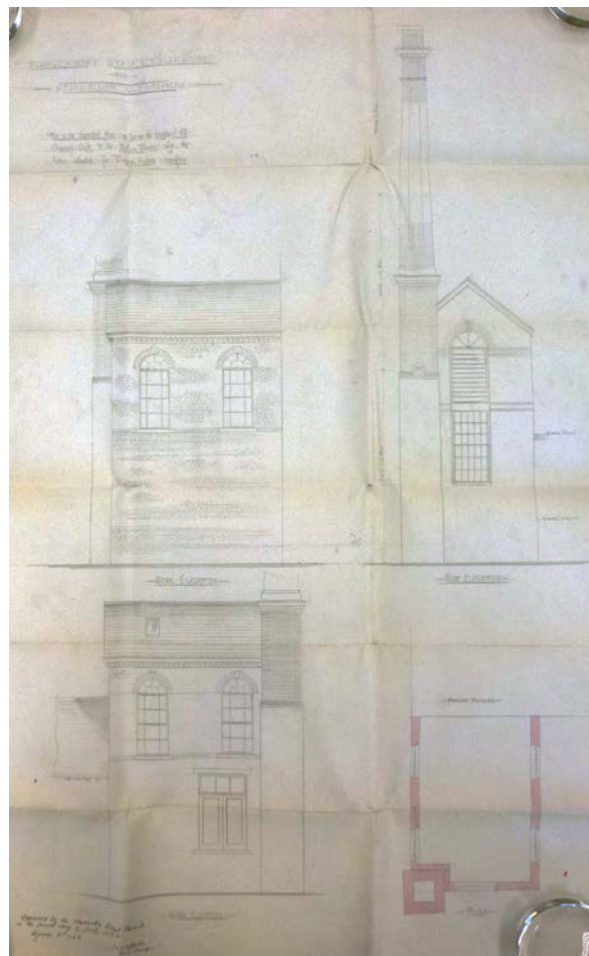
Plan and elevations of the chimney stalk and boiler house for Old Brewery, 1882
